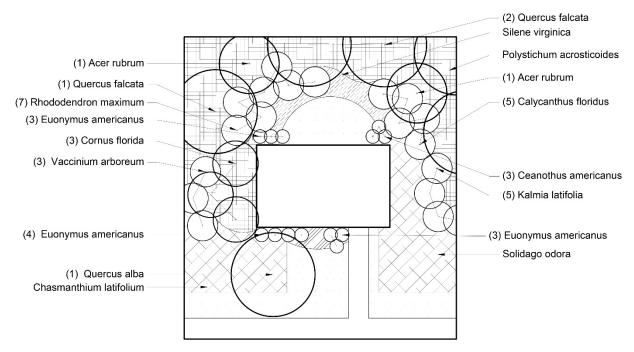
Planting plan for suburban yard in oak-hickory-pine forest suitability
